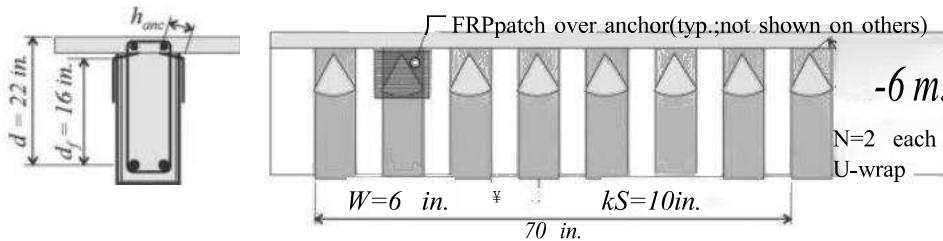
Configuration of the supplemental FRP shear reinforcement using FRP anchors.(Note:1 in.=25.4 mm.)
